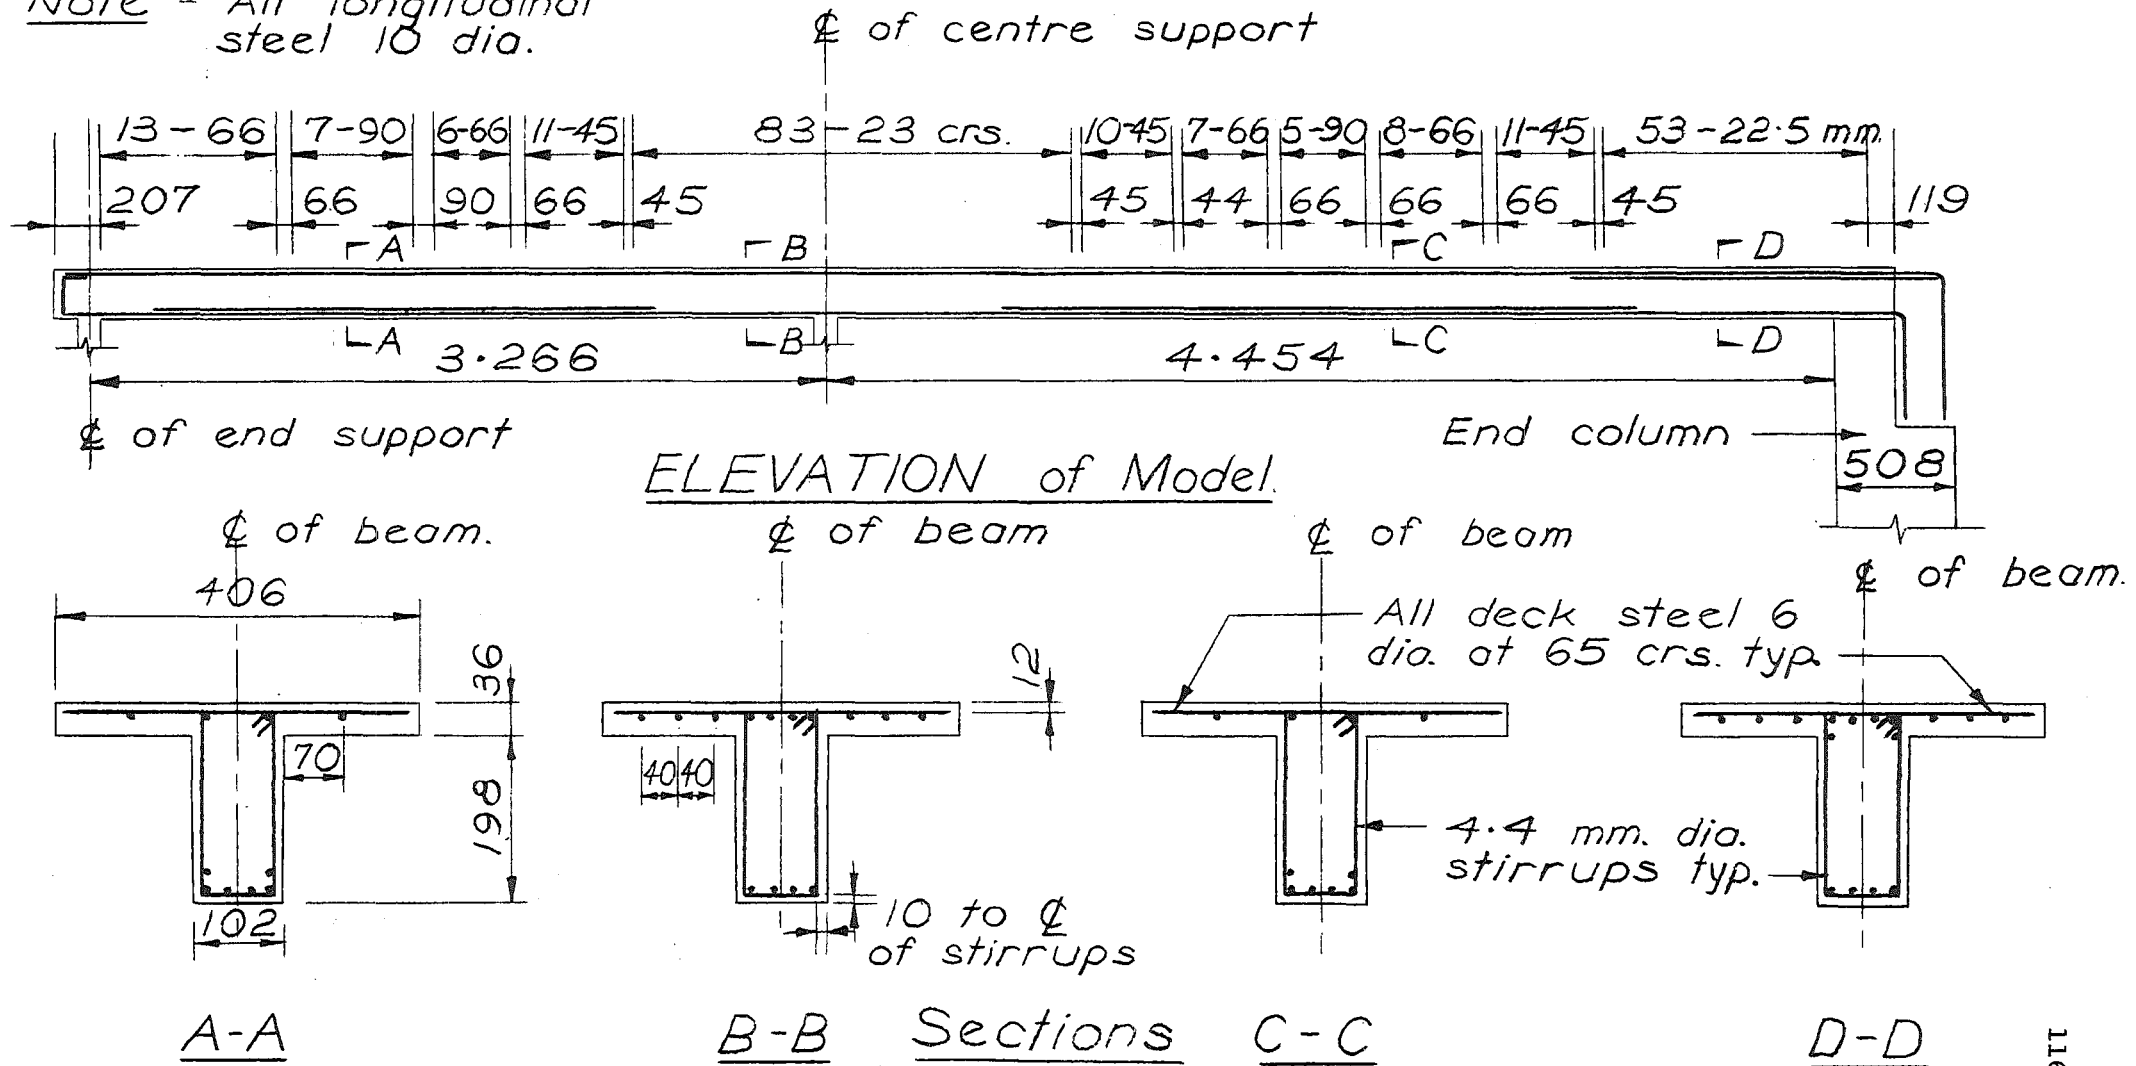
STRUCTURAL DIMENSIONS AND REINFORCING DETAILS OF BEAM TWO
